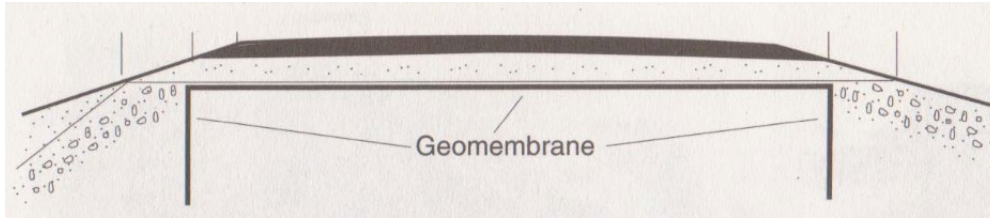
WYDOT Vertical and Horizontal Geomembrane Barrier Section Detail (Steinberg 1998)
